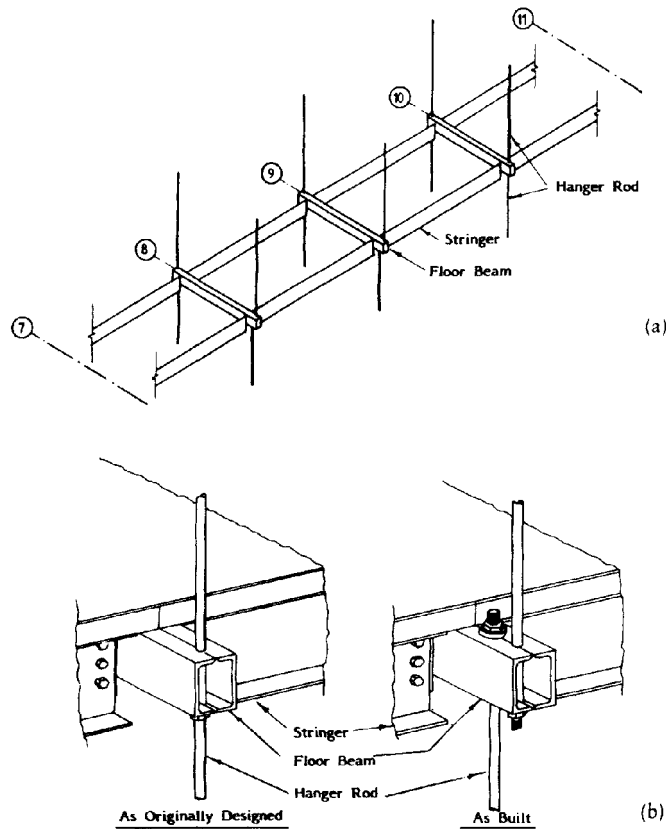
(a) General arrangement of framing of the walkway; and (b) Floor beam detail of the Hyatt-Regency Hotel, Kansas City, USA.
